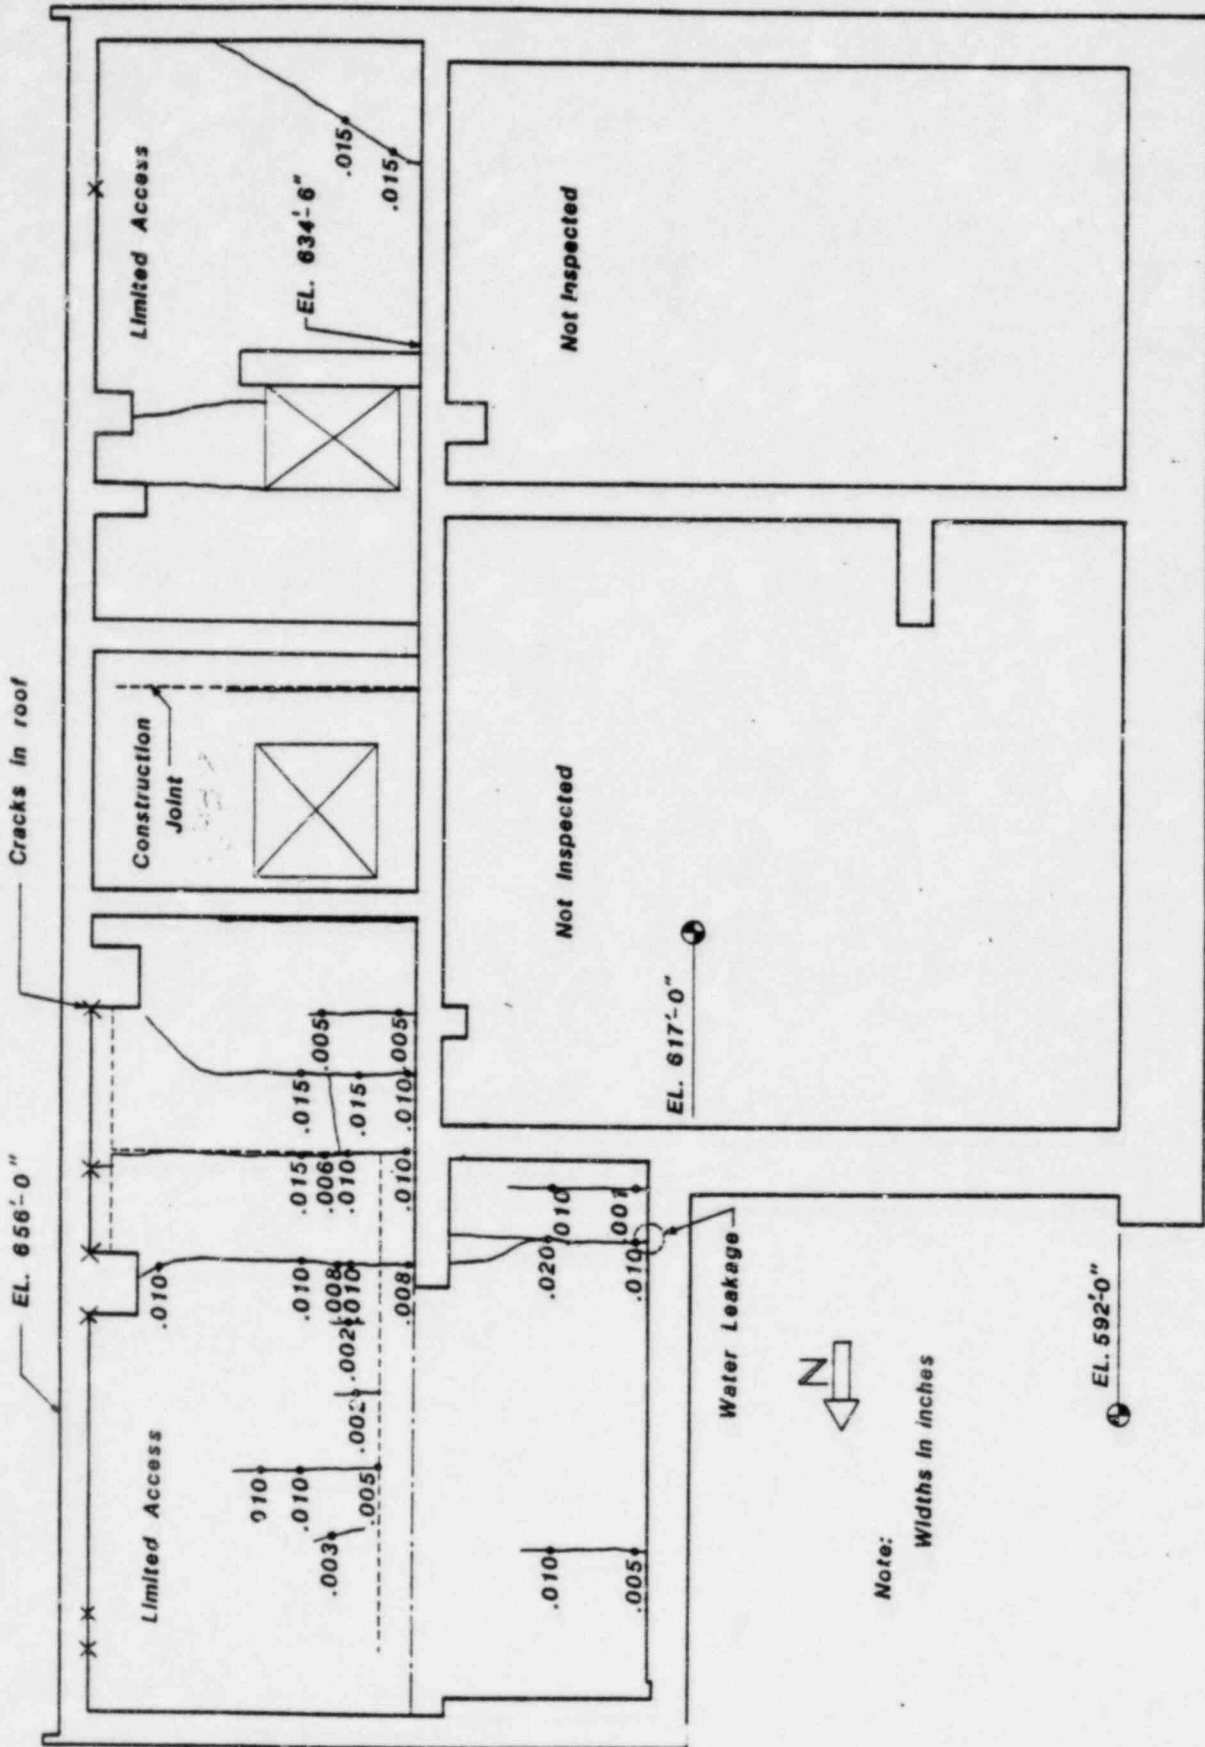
Cracks Observed in East Wall of Service Water Pump Structure on November 4, 1981
